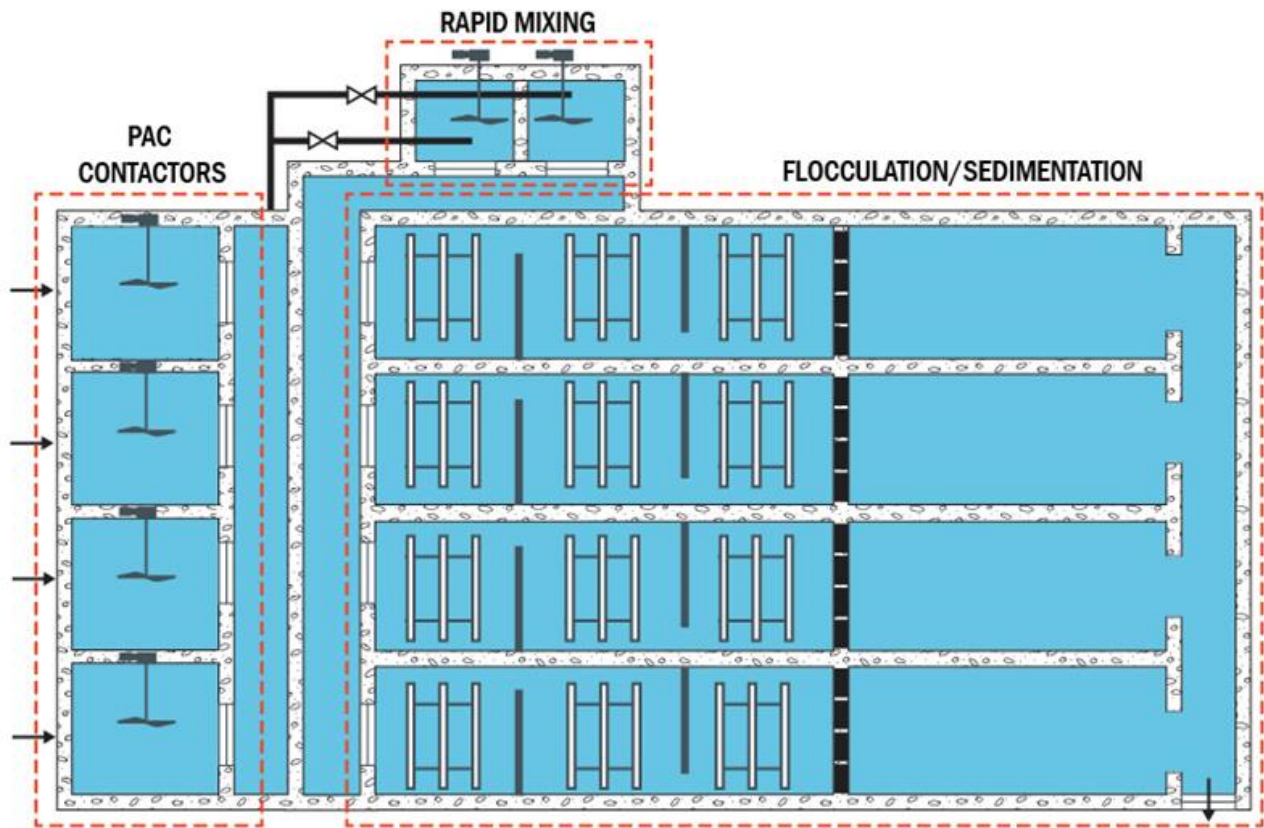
Conceptual Layout of Common Walled Pretreatment Structure
